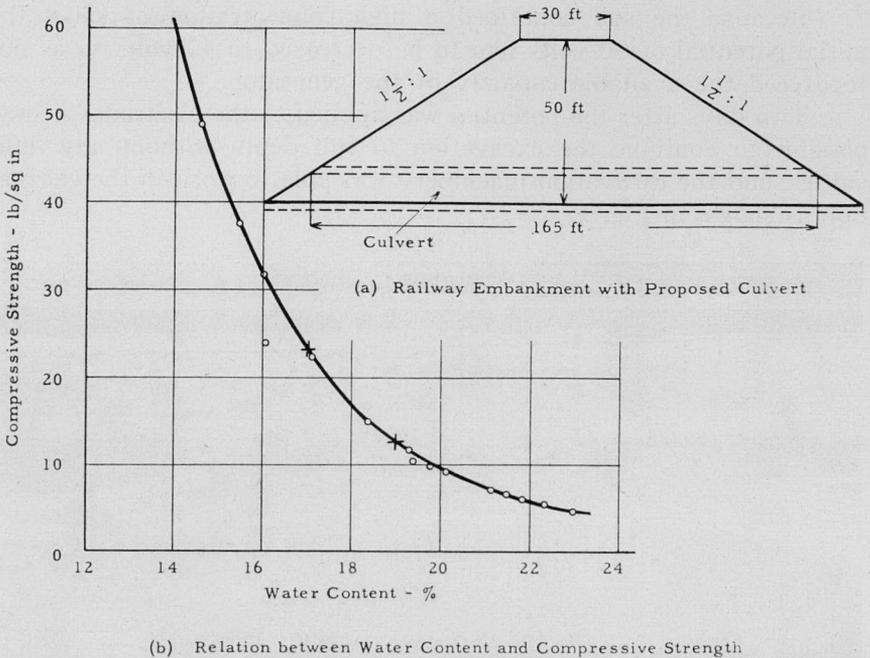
(a) SECTION THROUGH RAILROAD EMBANKMENT. (b) RELATION BETWEEN STRENGTH AND WATER CONTENT OF FILL MATERIAL.
